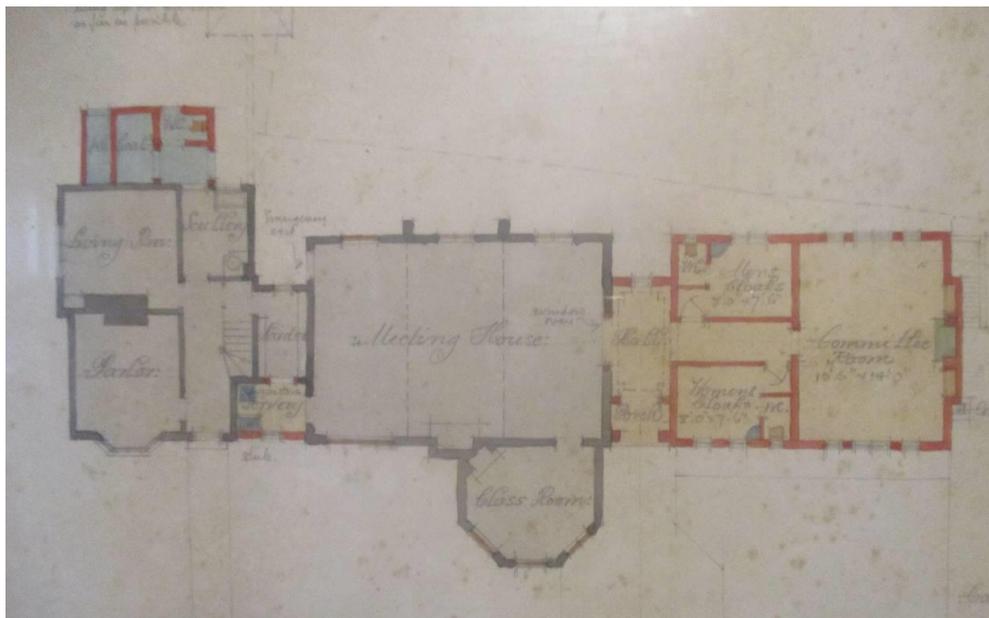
Ground floor plan of proposed extensions to the meeting house by Norris Edward Berks, 1930 (Hall Green MH Archive)
